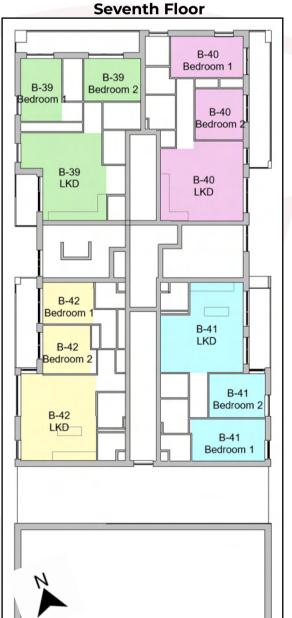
Floor plan of assessed building & Keyplan highlighting the assessed building.
